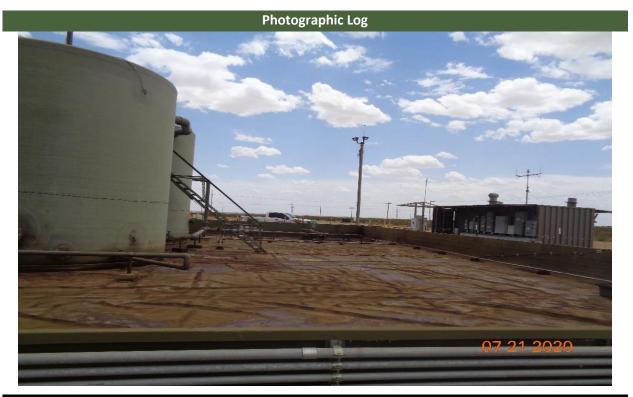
Typical view of the interior of the berm at the site. 7/21/2020
